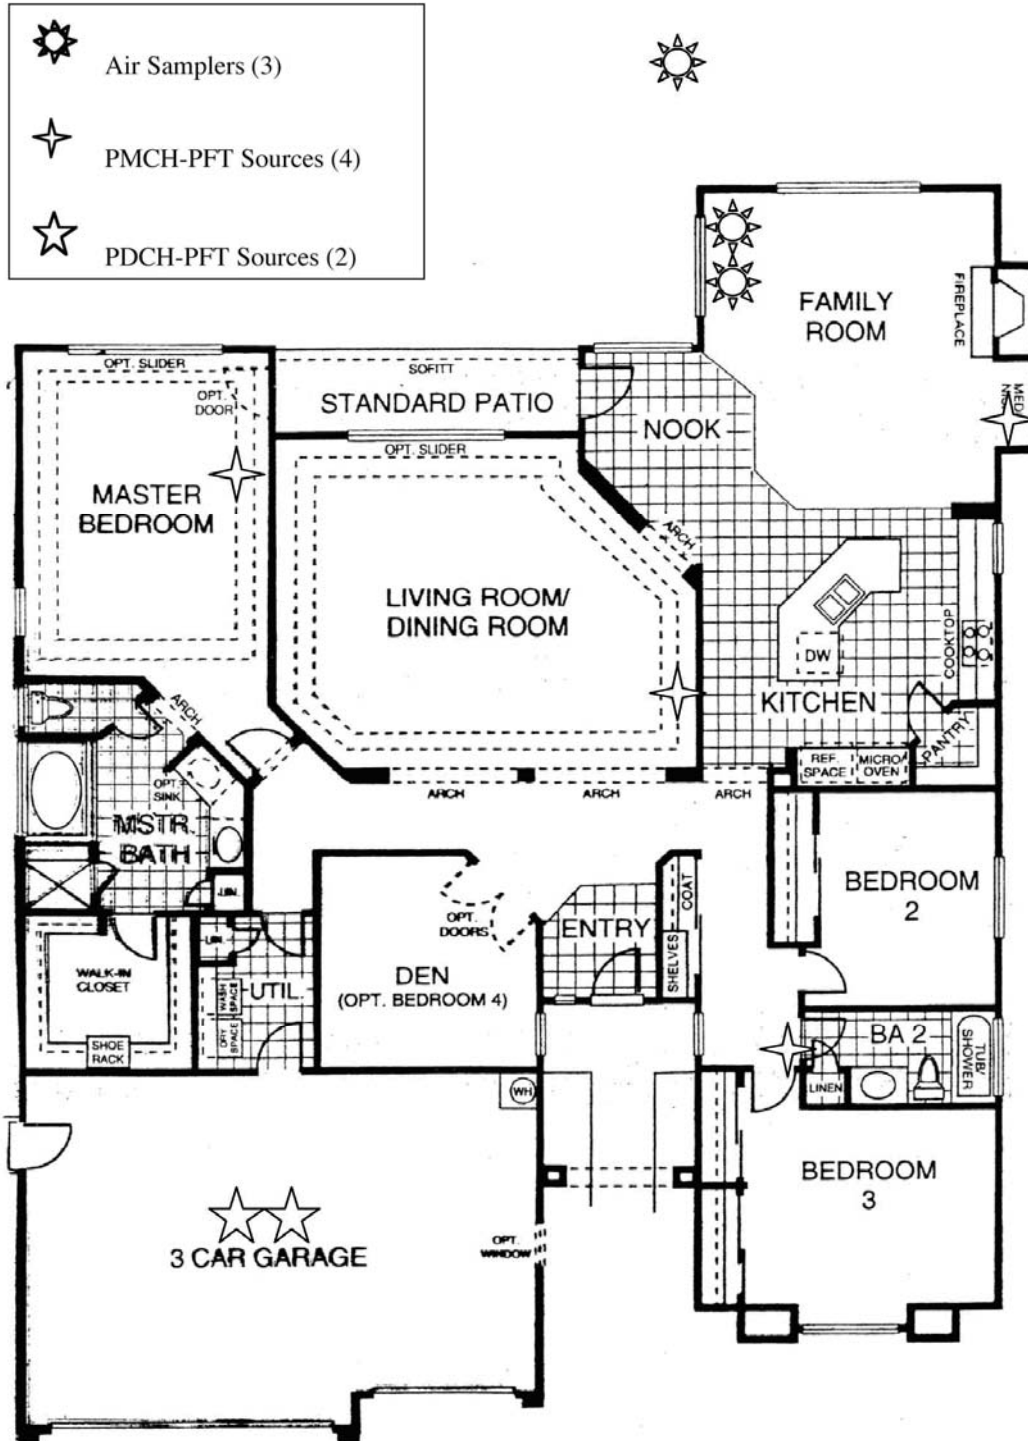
Floor plan of Home P1 depicting the locations of the air samplers and the PFT sources.
